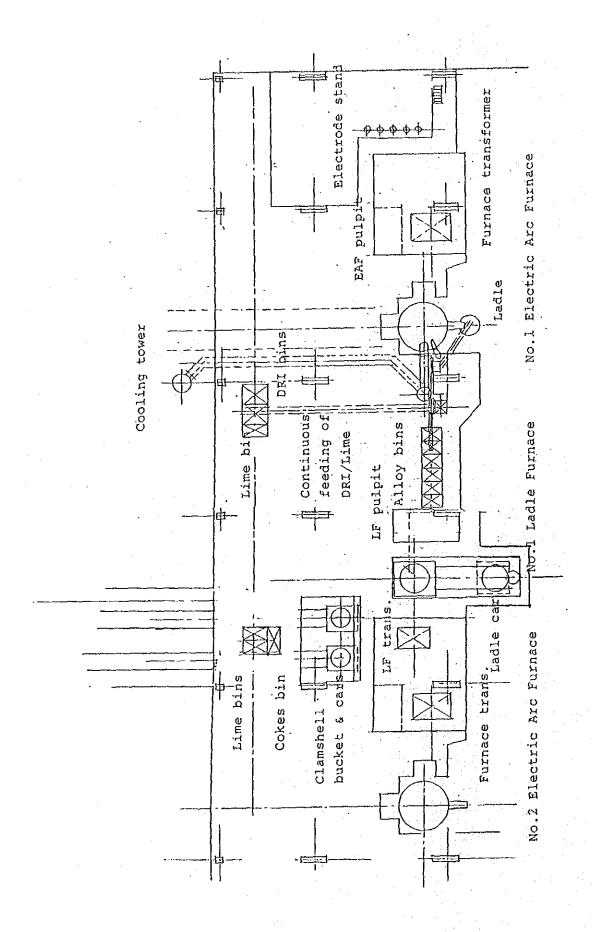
The Layout Arrangement of Furnace Bay
